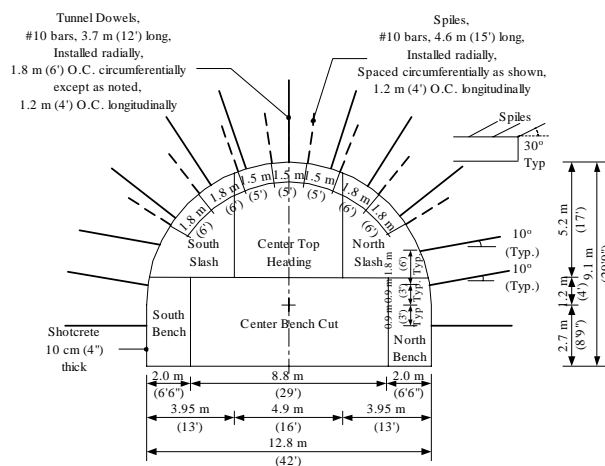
Tunnel Cross Section and Primary Support System 3 (SS3)
